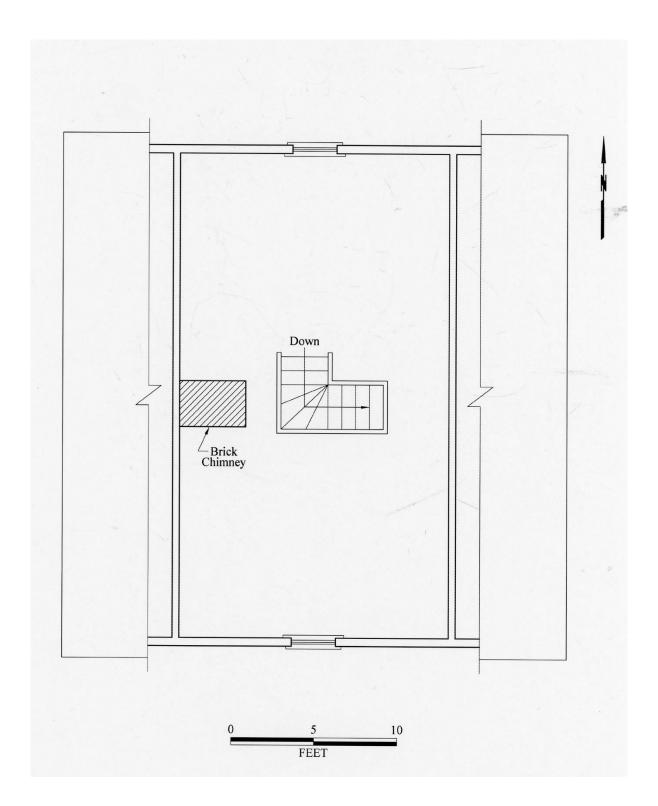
Conjectural second floor plan of House A. This likely was used as supplemental bedroom space and/or for general storage. The stair layout and room width is speculative.
